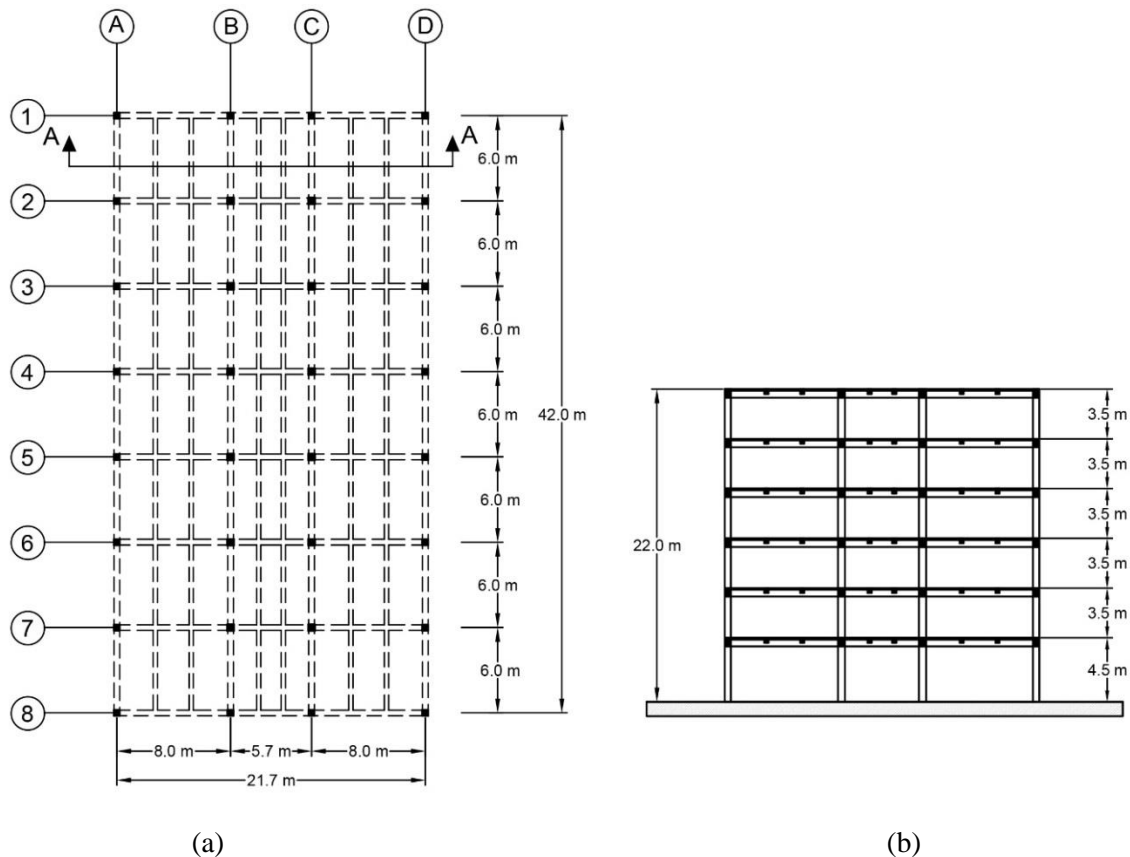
The prototype building: a) plan view; and b) elevation view (Section A-A)
